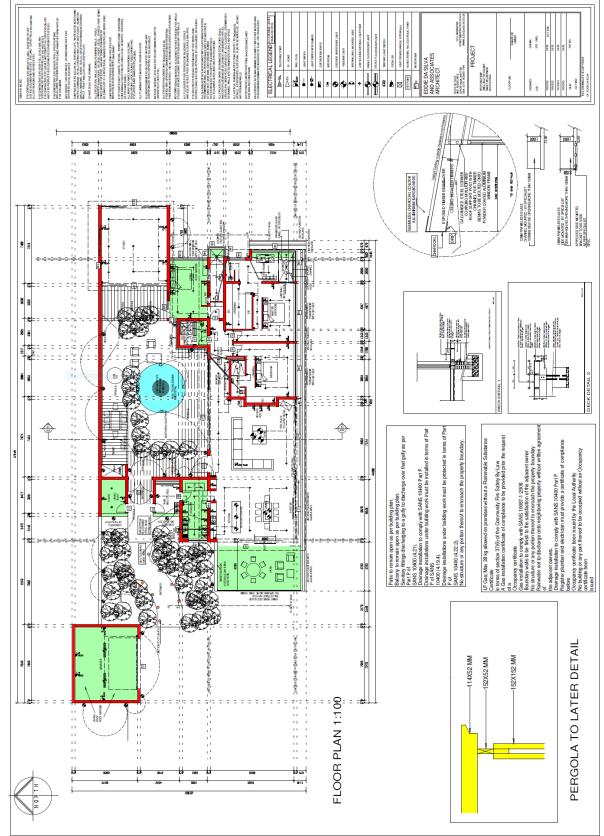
Main Dwelling – Floor Plan, Courtesy of Eddie Da Silva and Associates Architect. Please see Annexure C.
